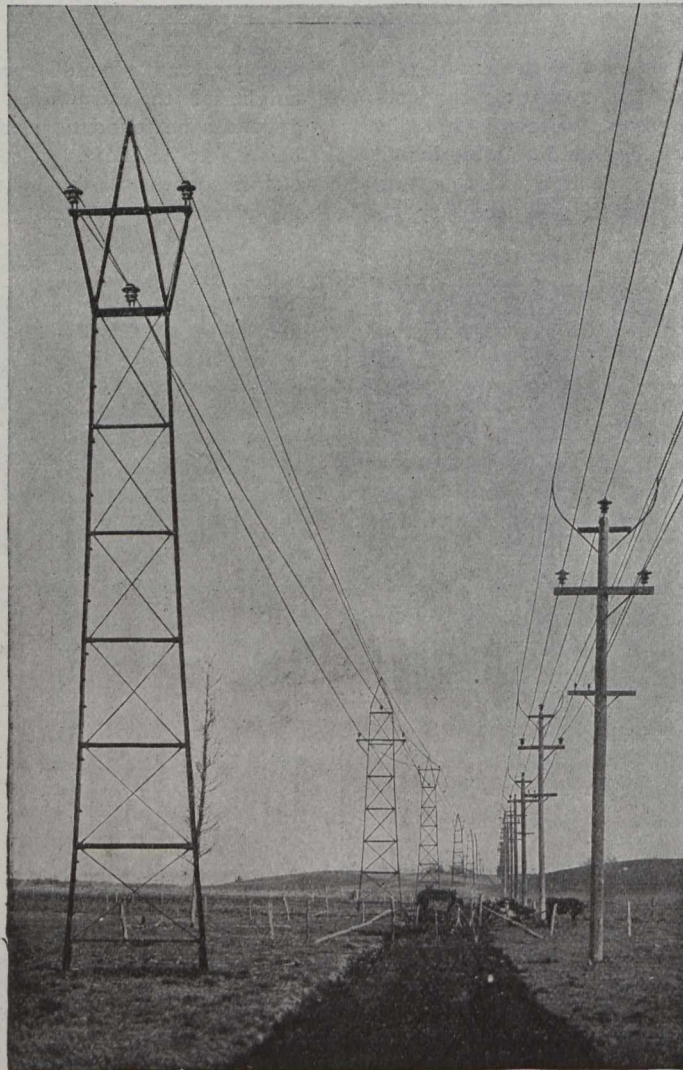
Simple Braced "A" Frame Steel Tower.
